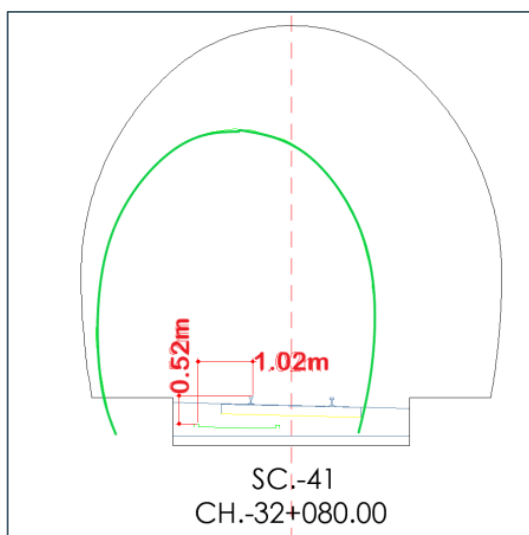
Schematic cross-section of the Rogozhine tunnel
